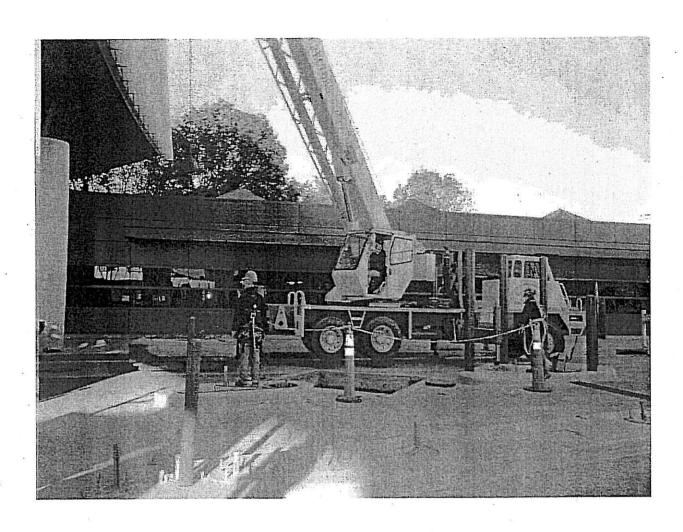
Removing Falls Street Tunnel Drop Shaft Zero Vault Cover
